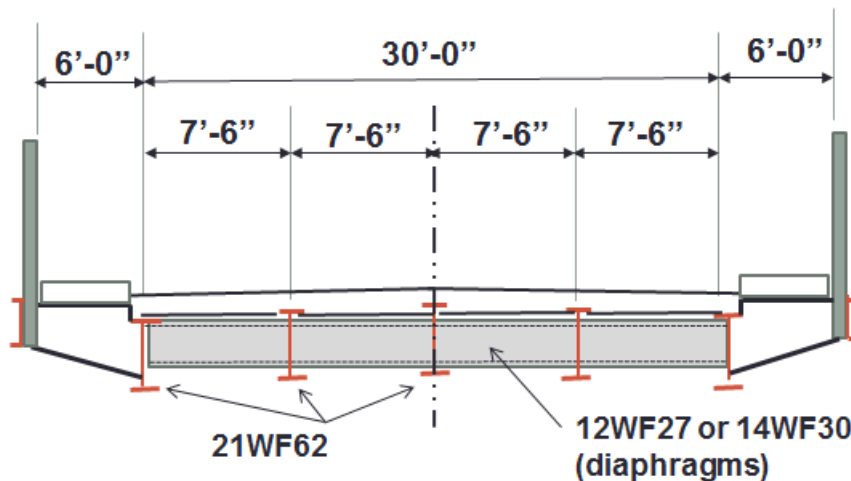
Bridge #0283, cross section of the steel girder superstructure
